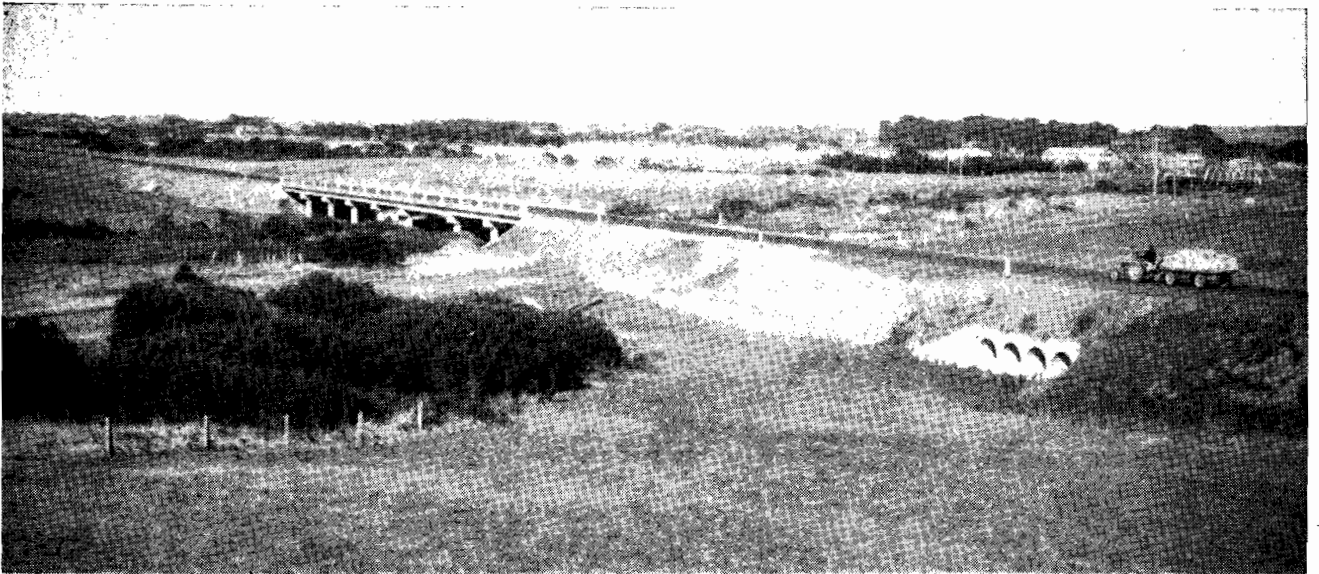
New bridge and culvert on a new alignment of the Bass Highway, over the Powlett River.
